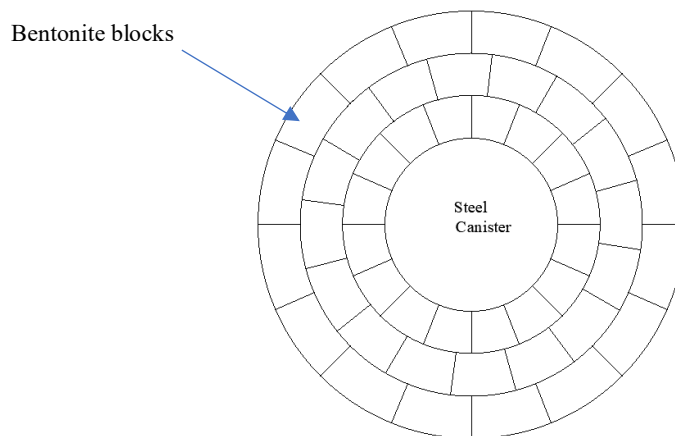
Geometry of steel canister and bentonite blocks emplacement
